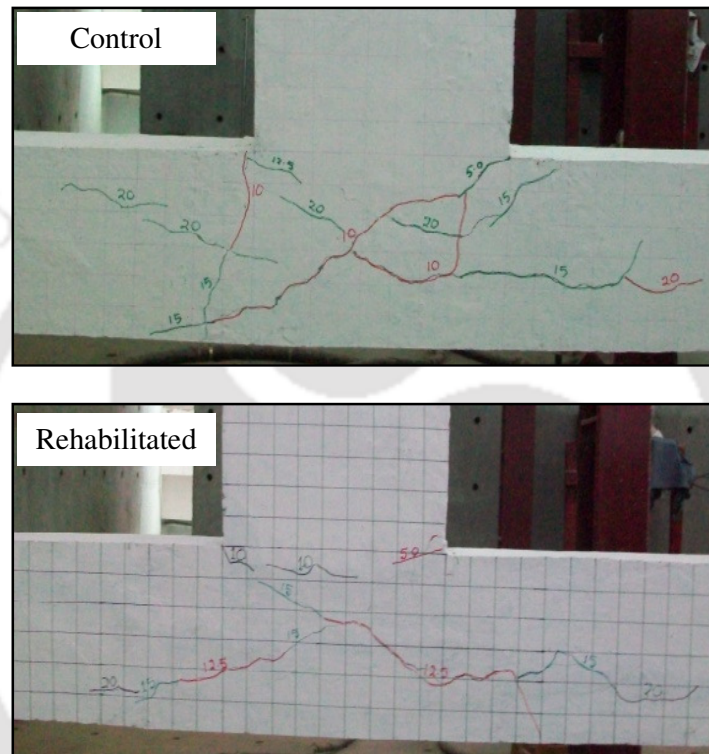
Cracks appearance for CWSL specimens during initial stages of loading under loading type-2
